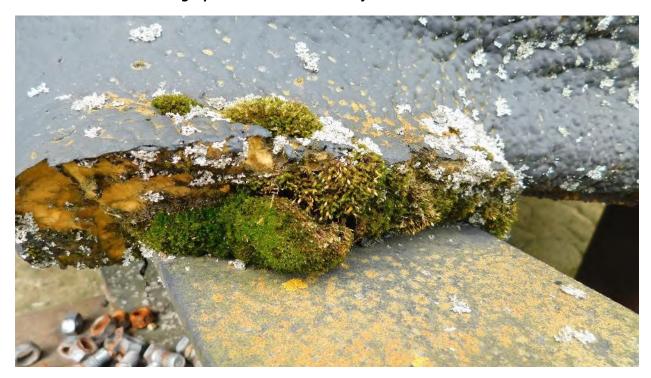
Tank Resting on Piles and I Beam Structural Steel
